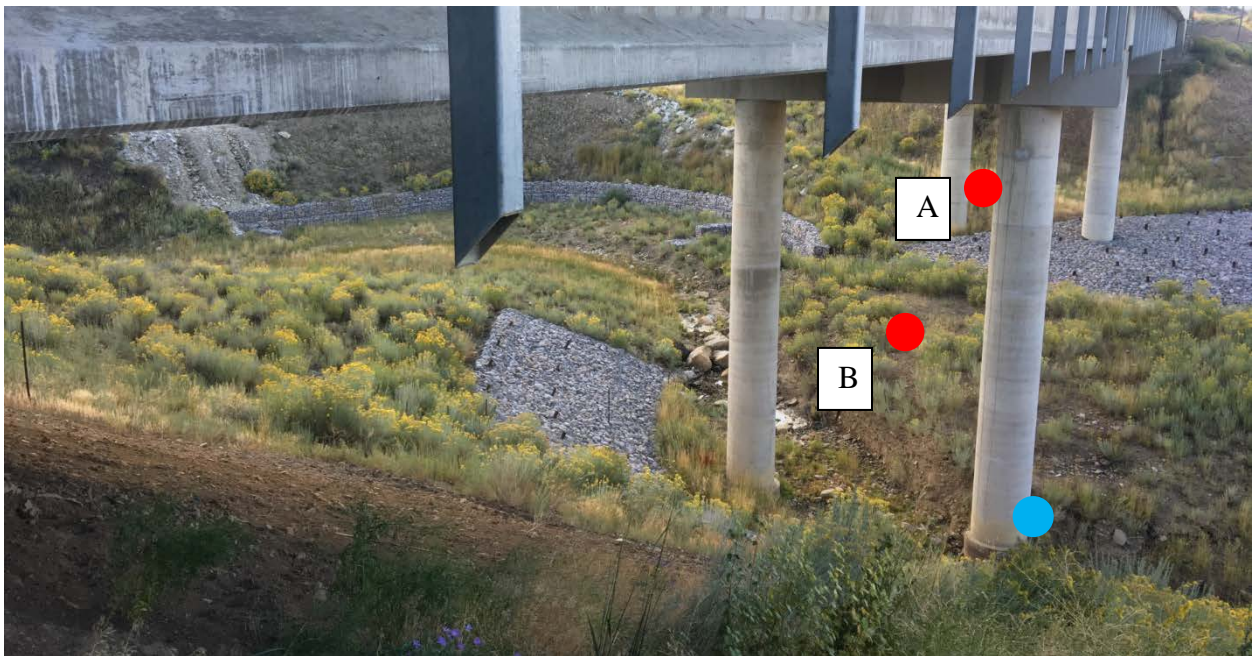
Pole installations (red circles) and pier installation (blue circle) at Bridge #9415, looking south.
